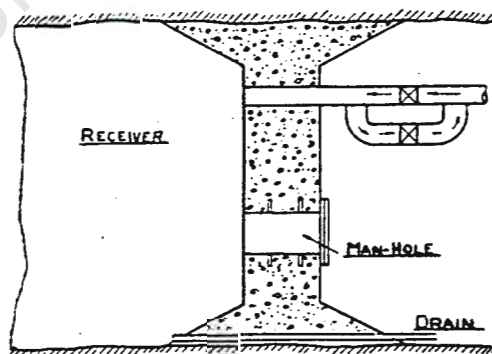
Standard friction concrete plug⁽¹²⁾
